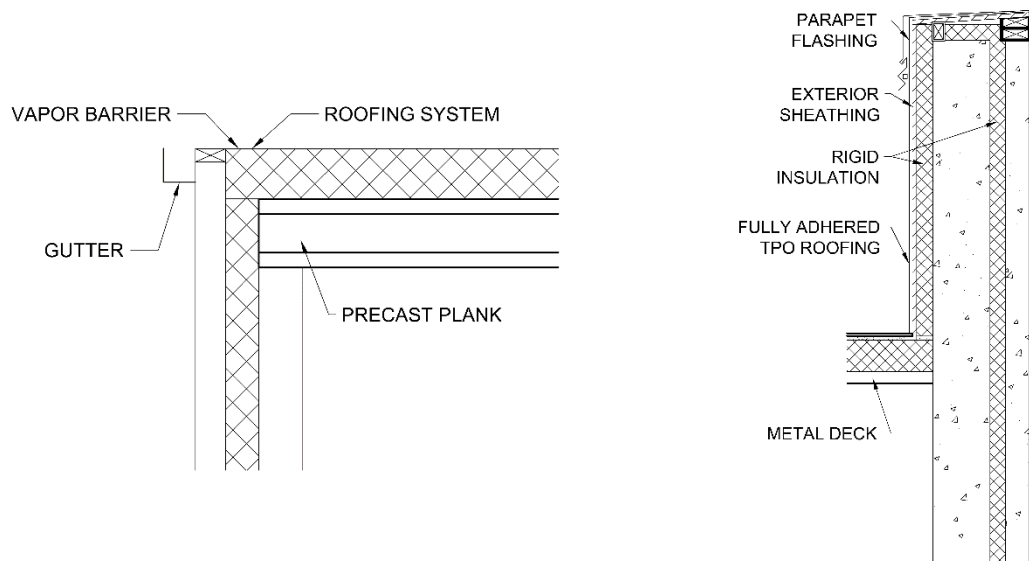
Sample of ideal roof termination details where wall and roof insulation tie together
